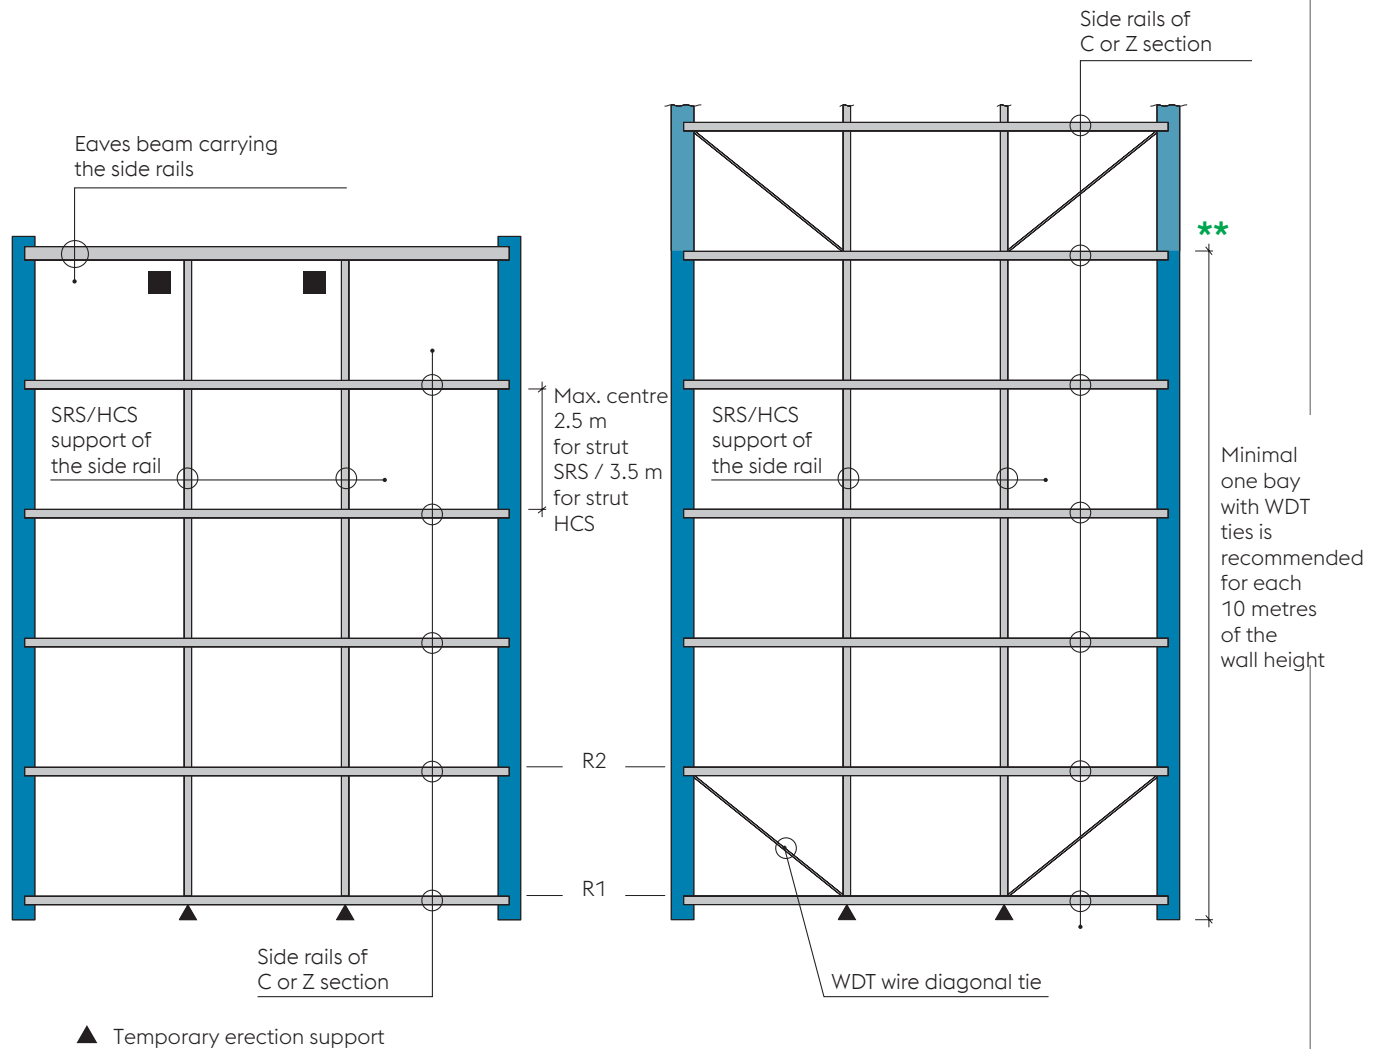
Layout of side rail supports for spans of 6.10 - 10.00 metres
